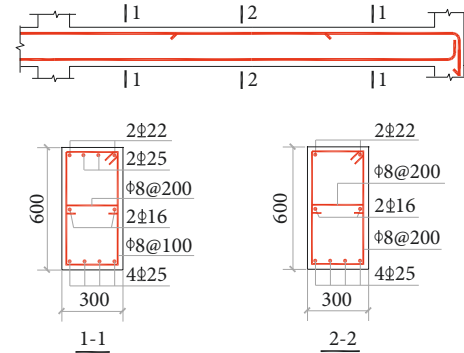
Diagram of reinforcement configuration of the frame beam section.
